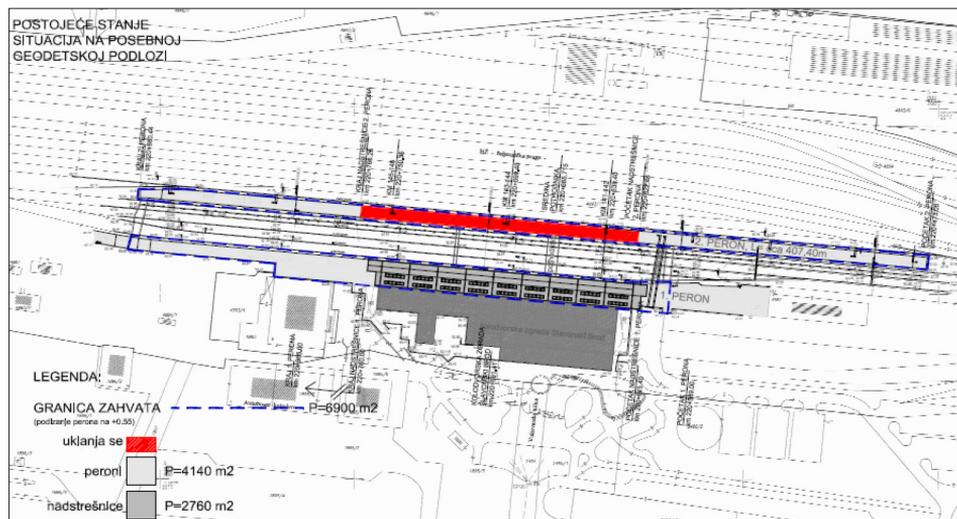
Railway station Slavonski Brod – the current condition floor-plan on the special geodetic lining
